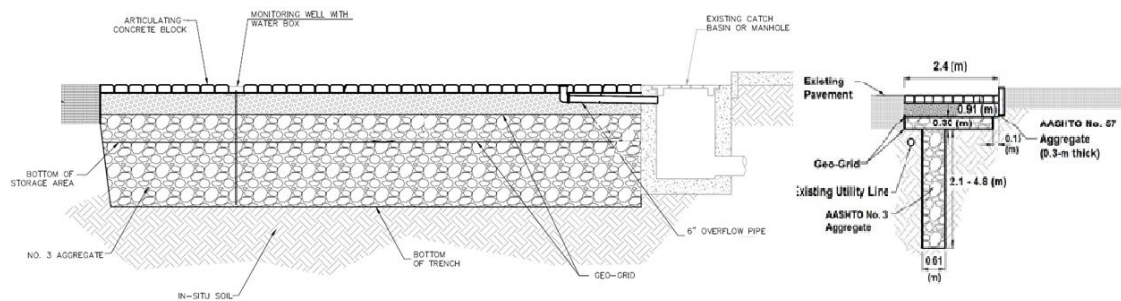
Longitudinal cross section (left) and cross section view (right) of permeable pavement 17 G (trench system)
